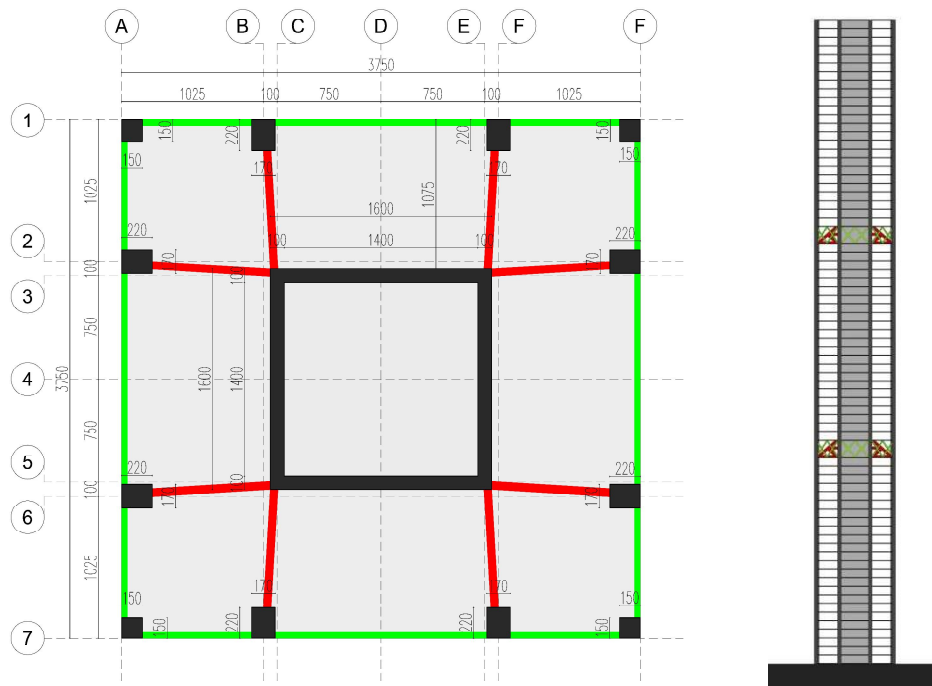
Typical floor plan and elevation of model "OF_OPT_4a" with outriggers and belt trusses
